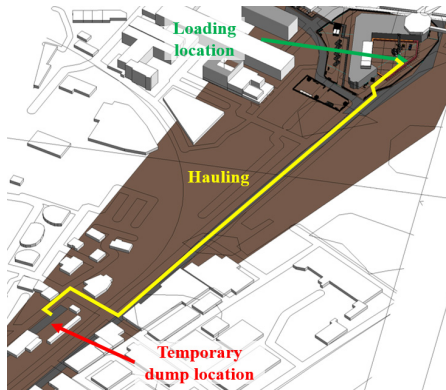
BIM-based construction site layout visible in the online user interface on the Digital Twin Platform
